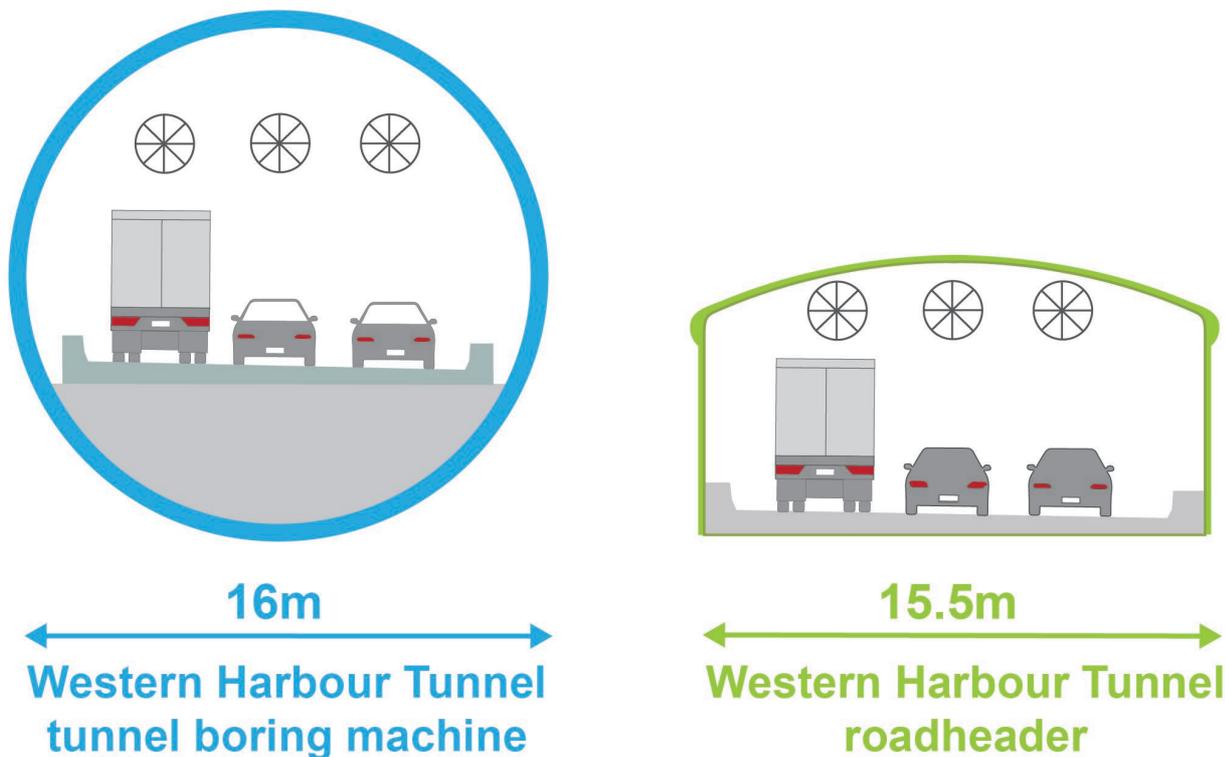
Comparison of tunnel cross-sections using a tunnel boring machine and a roadheader
